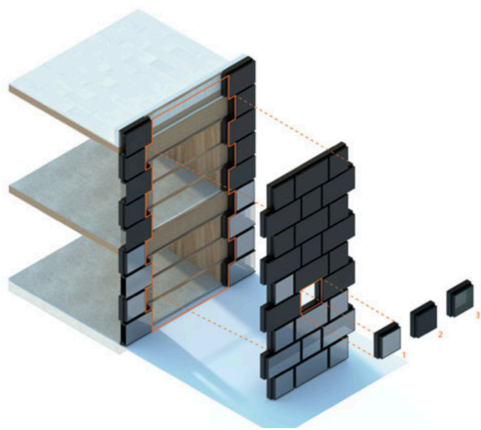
3D view façade (ArchitectenCie, n.d.)
